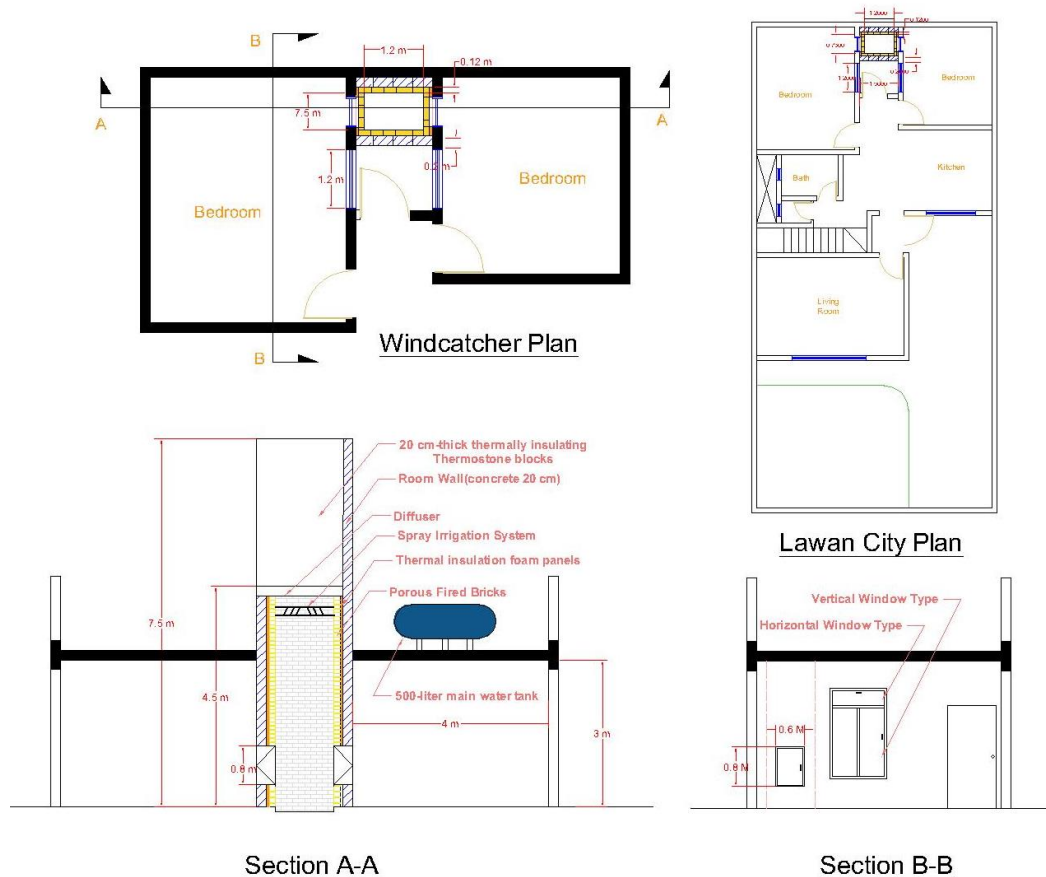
House Plan after adding the wind catcher, wind catcher plan, and sections (Researcher)
